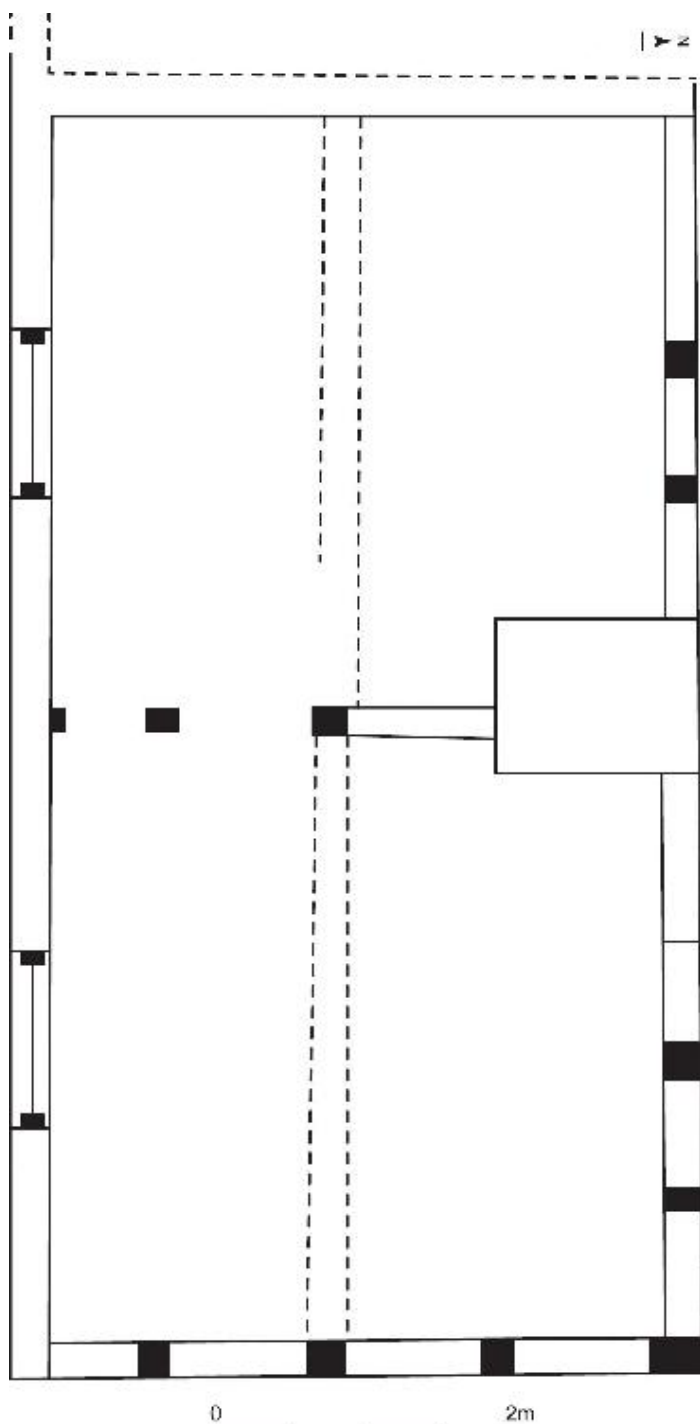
Basic sketch ground plan of 64–66 Widemarsh Street; Widemarsh Street is on the left
